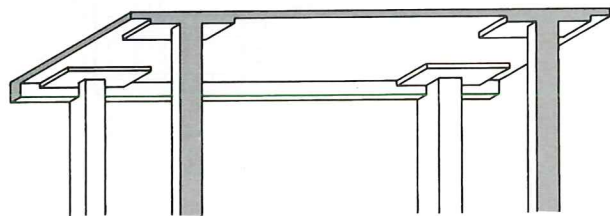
A flat slab roof utilizes a two-way reinforced structural system. It includes either drop panels or column capitals to carry heavier loads.
